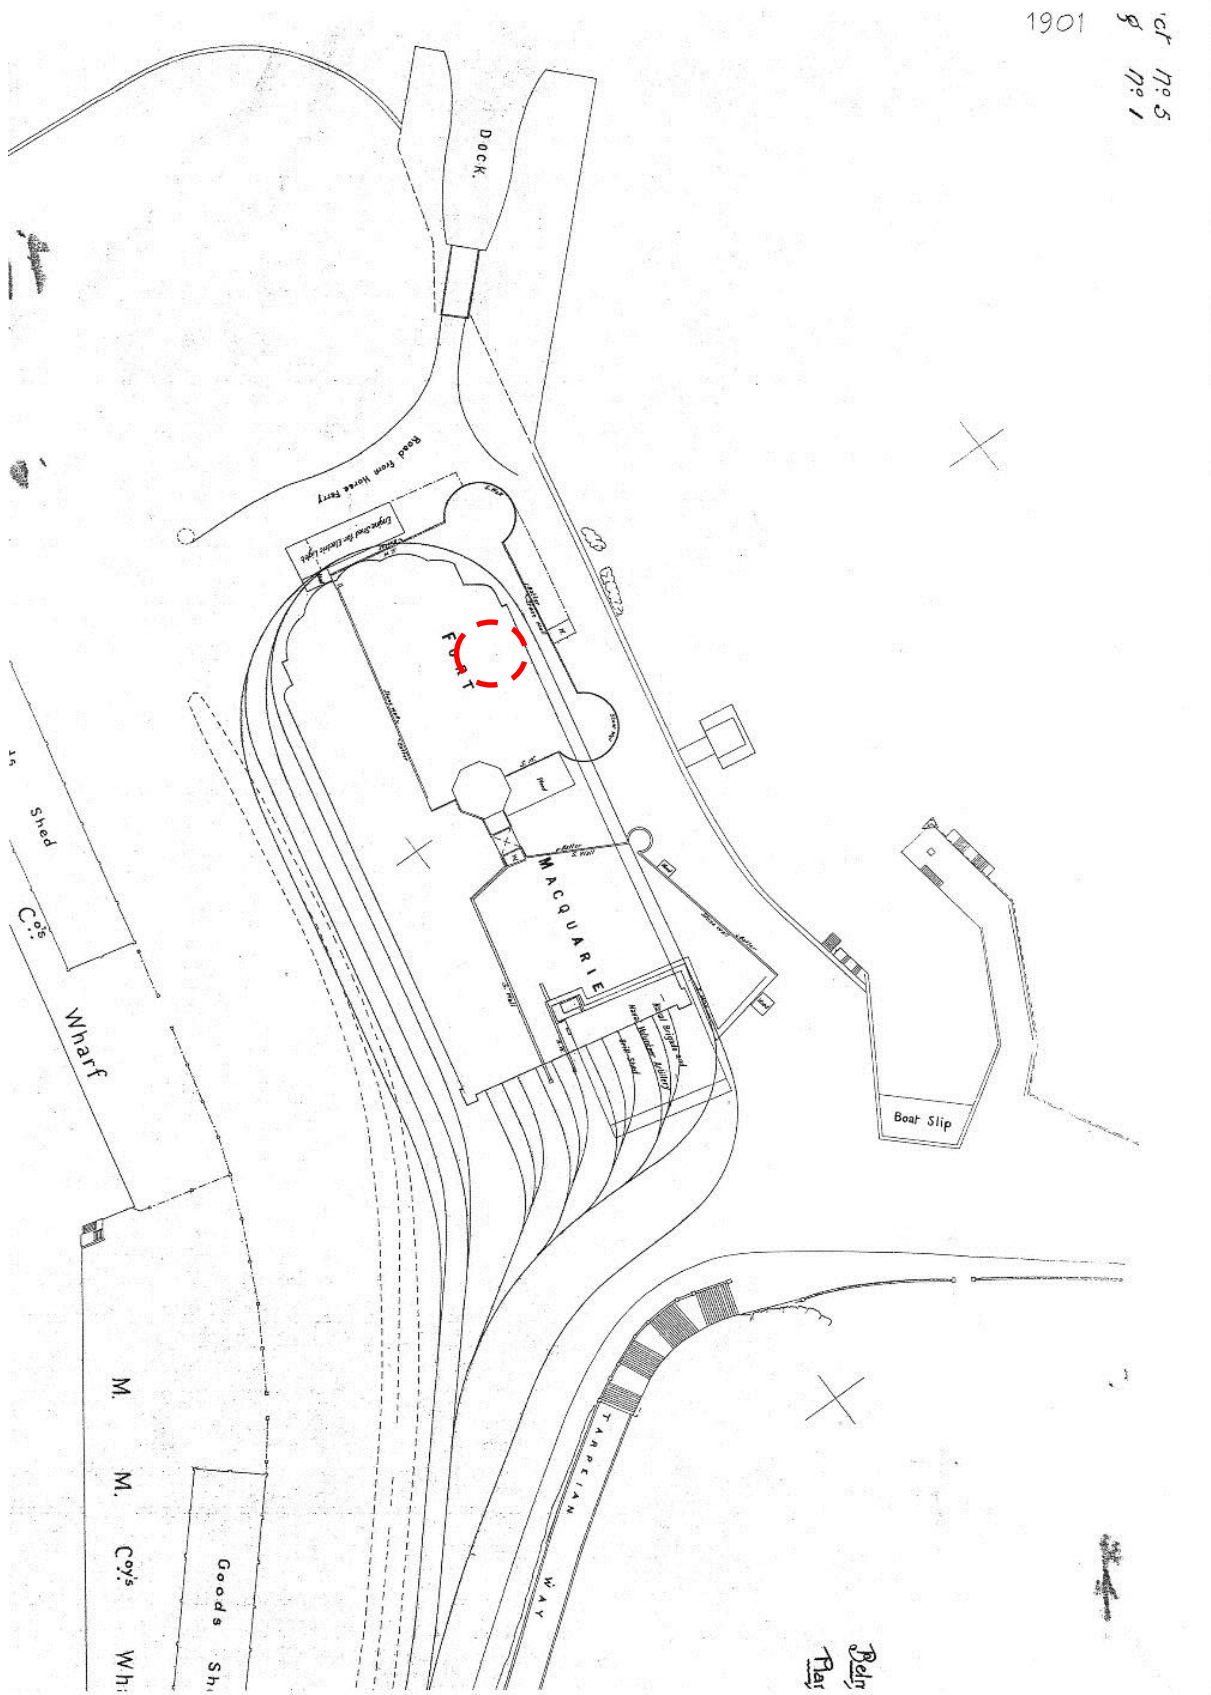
Extract of 1901 NSW Government Transport Plan—'Belmore Park to Fort Macquarie Electric Tramway Plan Showing Position of Car House...'. This plan shows the location of Fort Macquarie in relation to the Tramcar House and naval drill shed. The location of Lift 36 is outlined in red. (Source: NSW State Archives, CGS 12909, SR Plan No. 61078)
